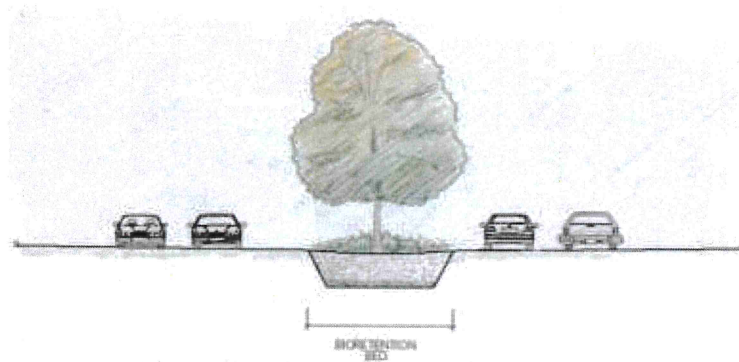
Cross-section view of a bioretention cul-de-sac. The island of the cul-de-sacs accepts stormwater from surrounding pavement
